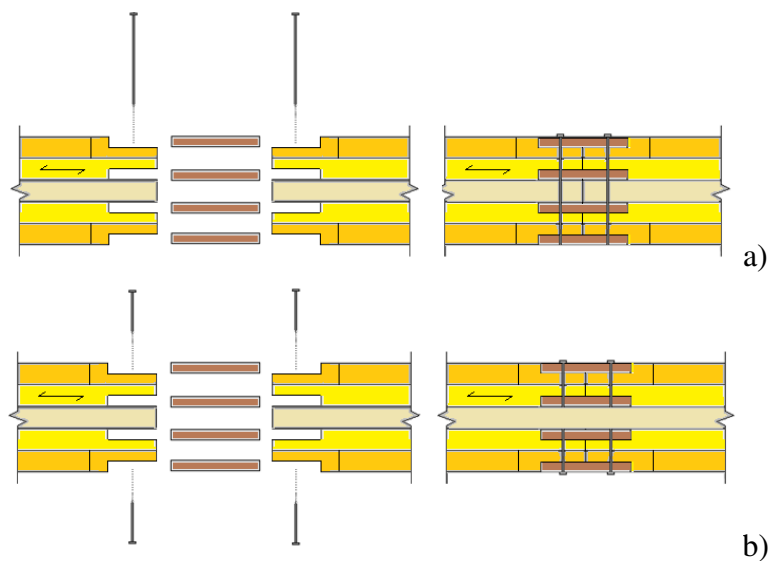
Multiple spline solution for aligned wall-to-wall or lateral floor-to-floor connections: a) with full-length fasteners; b) with partial length fasteners (double shear planes).
